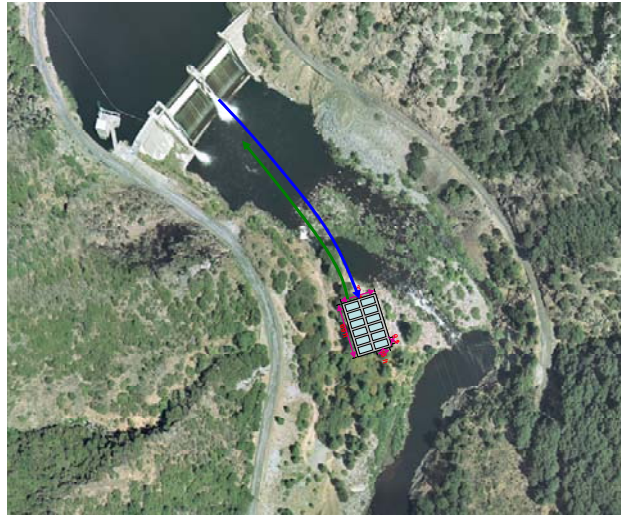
Plan view of chiller location on Cresta Reach; Pipe size = 4 ft; flow rate = 175 cfs
